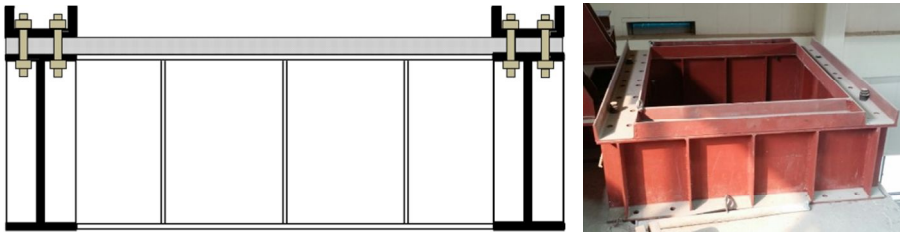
Test Specimen Black-out (up) and the Elevation (down)
